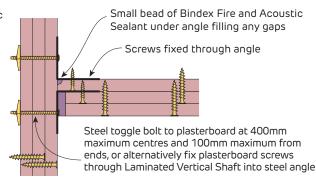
Laminated Vertical Shaft T IntersectionPlan view
